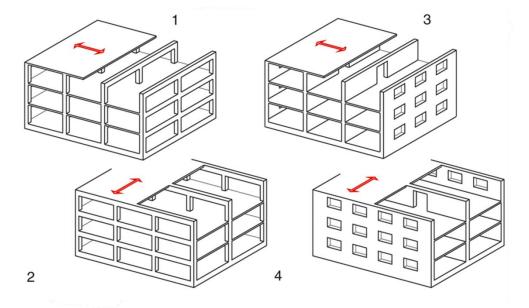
ONE DIRECTION BEARING CONSTRUCTION (KAMERLING & KAMERLING, 2004)
